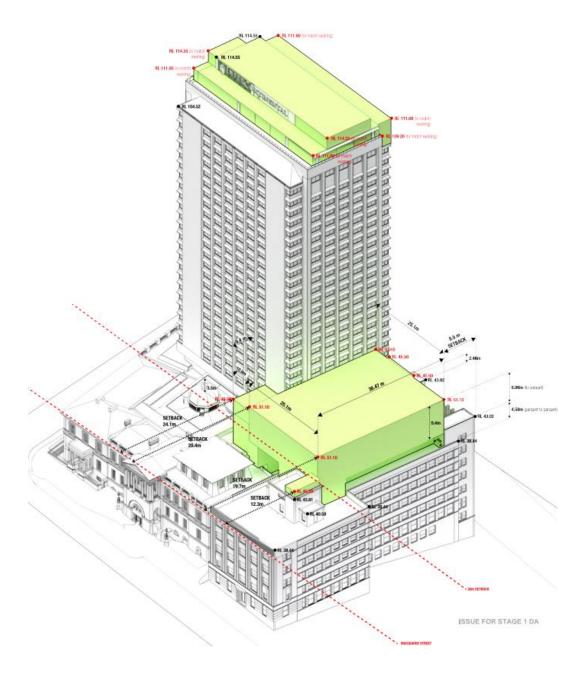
Concept approval of additions to Transport House and the InterContinental hotel (Source: Amended concept proposal - Woods Bagot)
